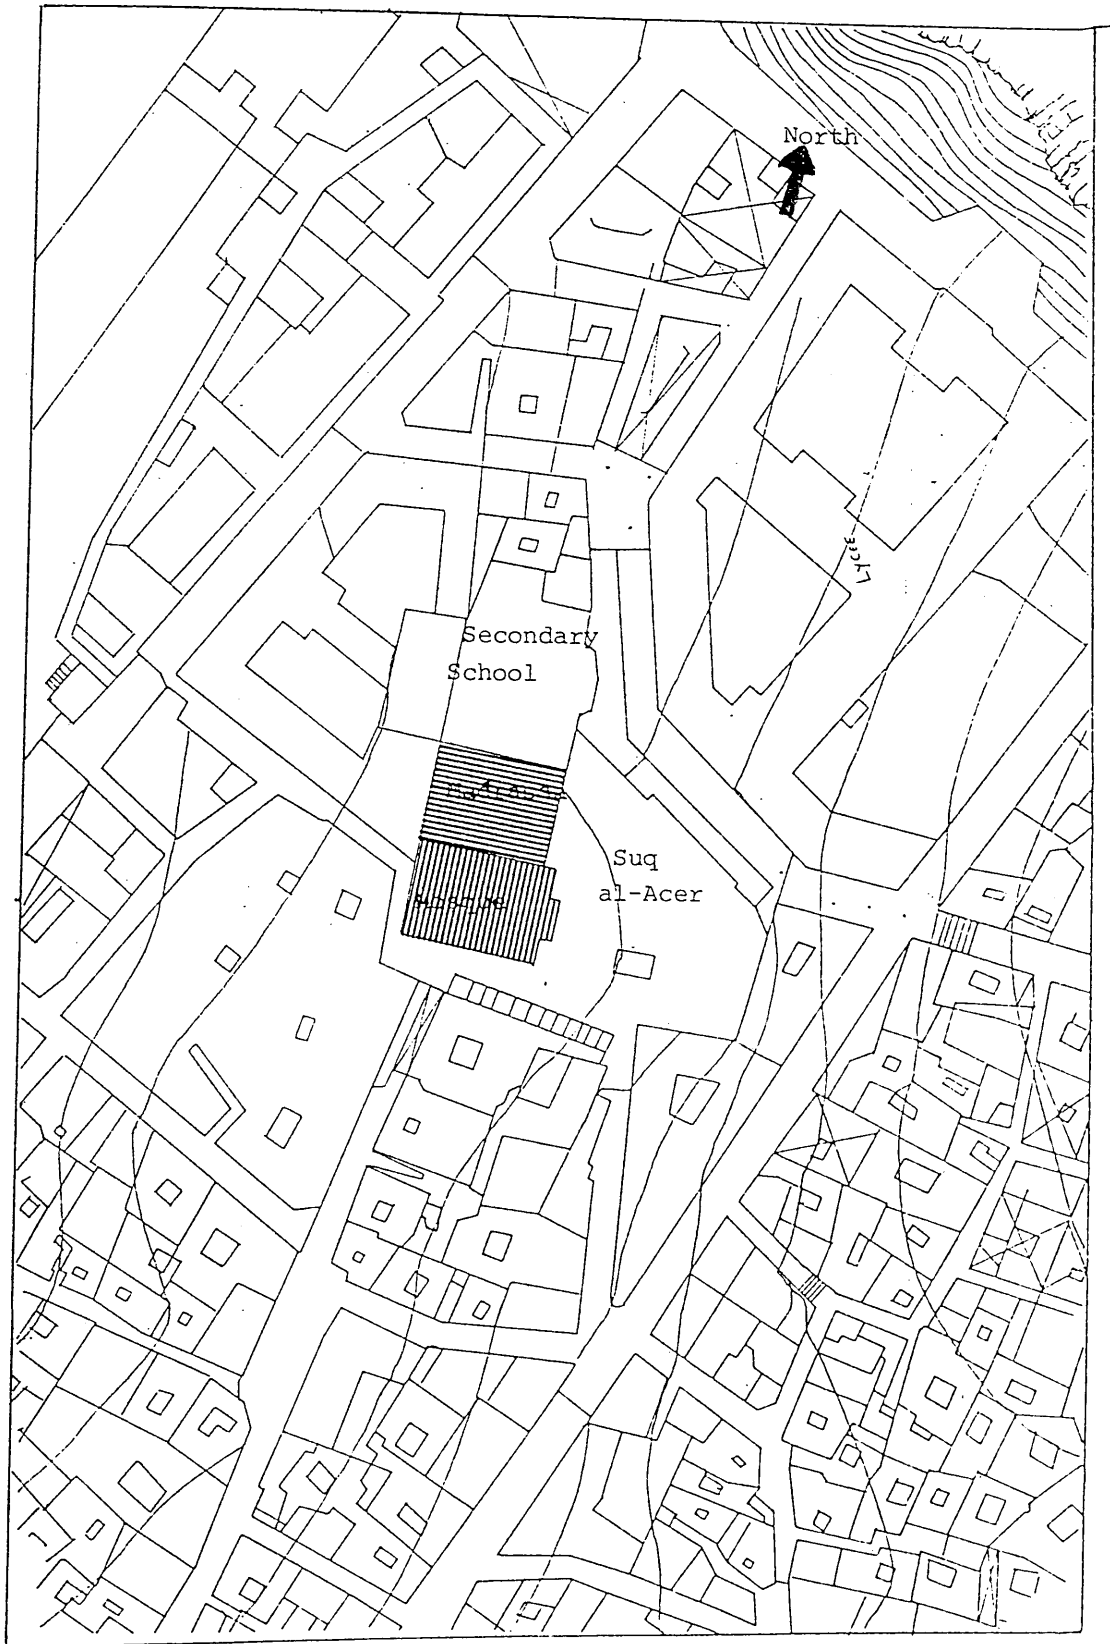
Location plan of Sidi al-Kettani madrasa and mosque.
